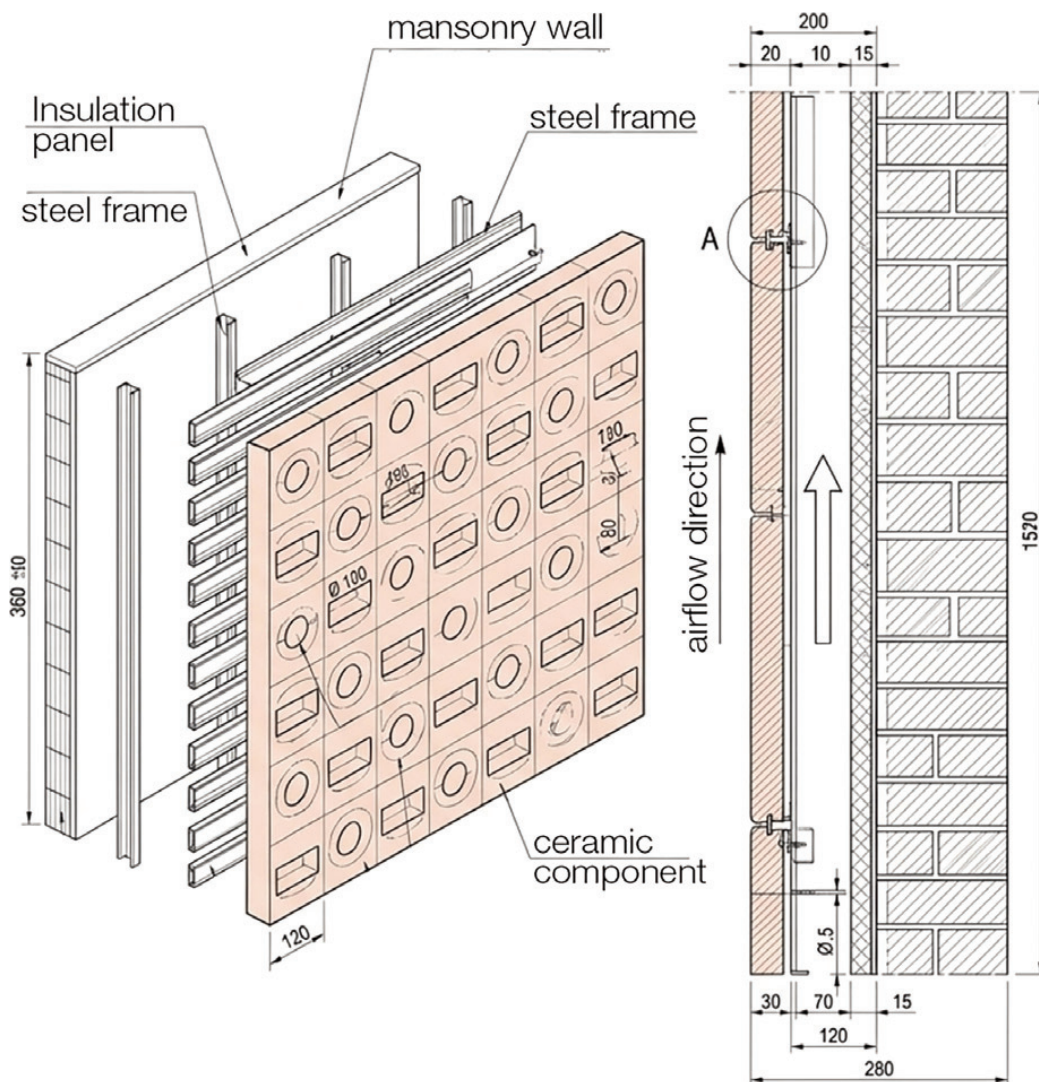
| Diagram of the fixing system and substructure of The Dome Wall façade system (credit: the Authors, 2026).
